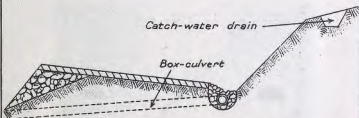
SINGLE SIDE DRAIN CONNECTED TO BOX-CULVERT.
